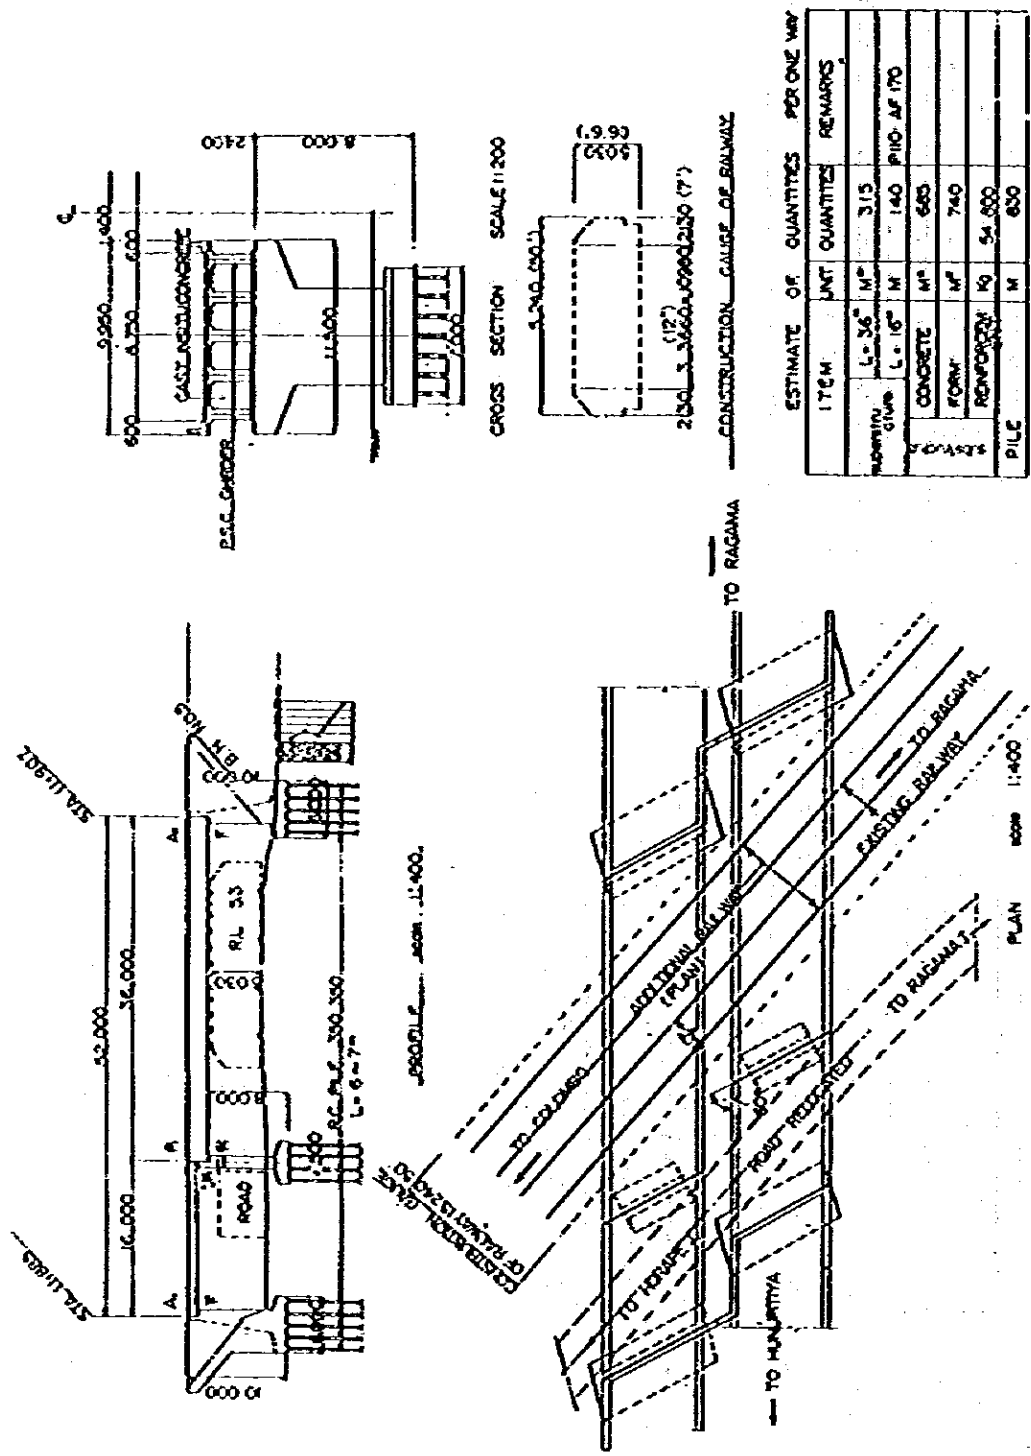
General Plan (Railway Flyover Near Horapa St.)
